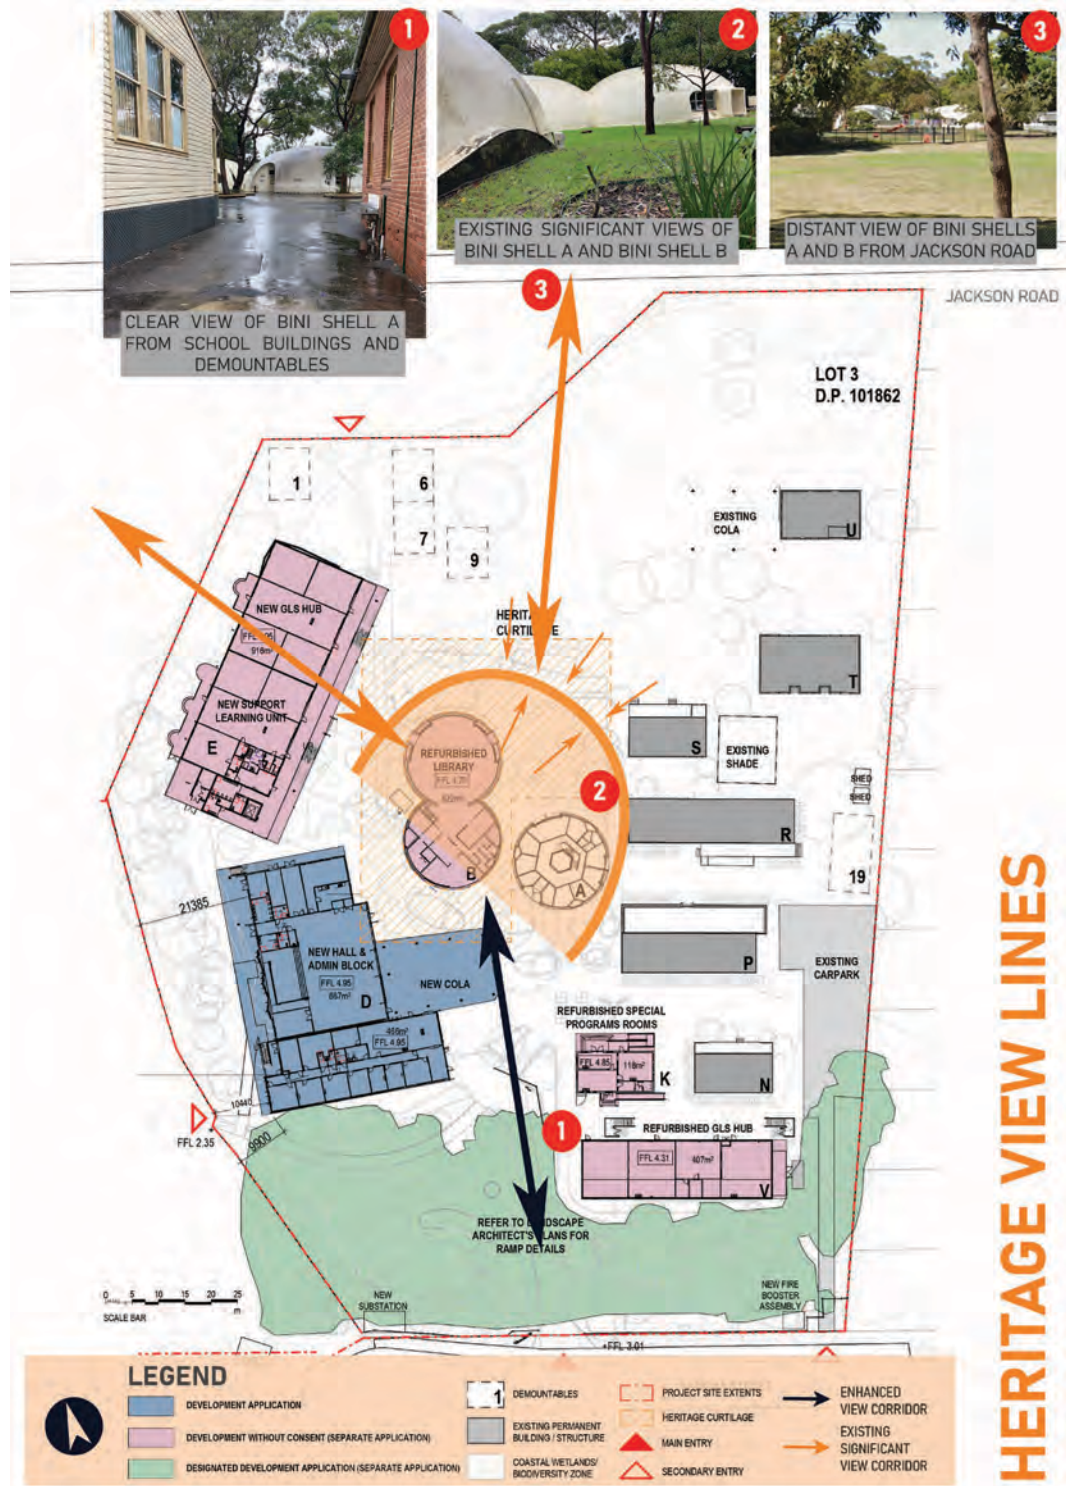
Proposed views and vistas at NNPS (City Plan Heritage)
